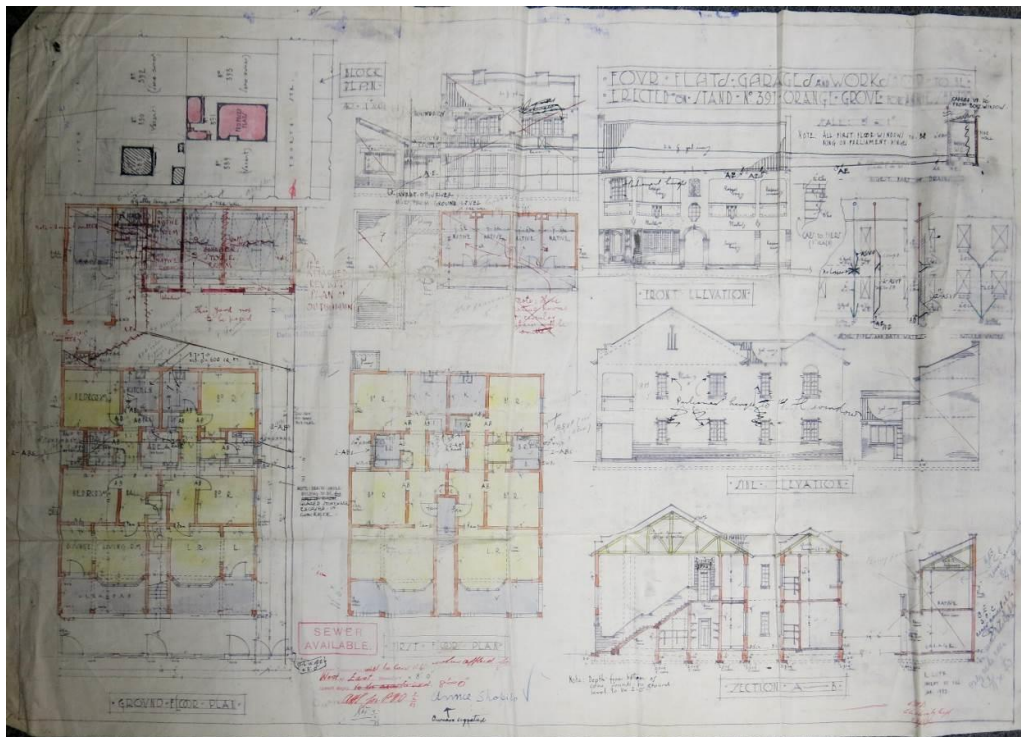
Plan for proposed four flats, garage and workshop on Stand 391, Orange Grove from 1938
